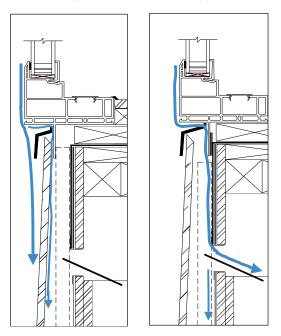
Sectional views of W3 showing projection of window above cladding at lower exterior corner of wall-window interface
